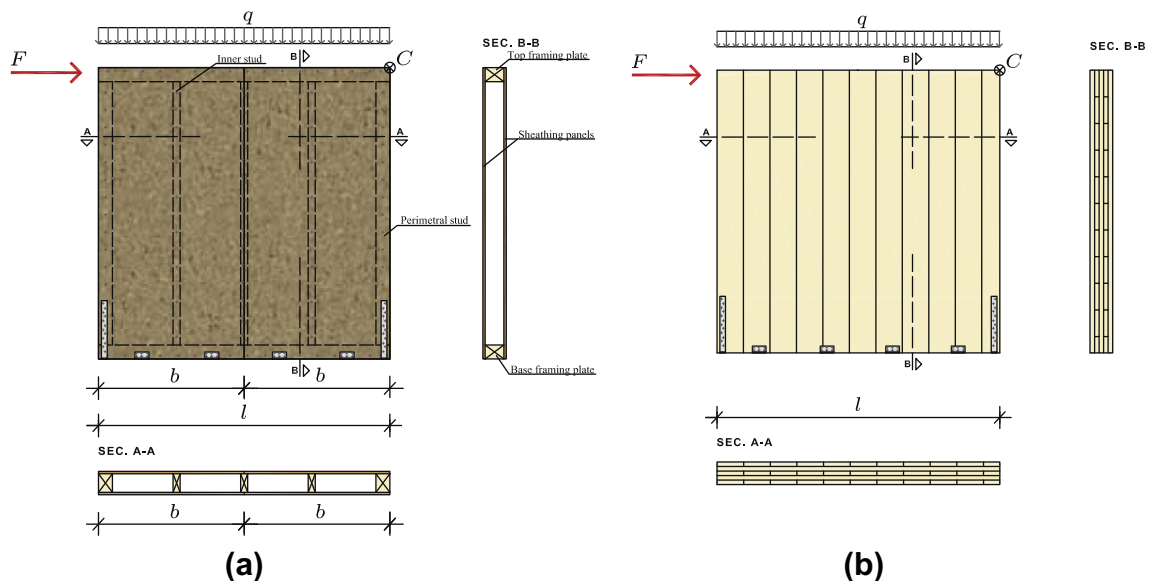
(a) TF (timber framed wall); (b) CLT (cross laminated timber wall).
